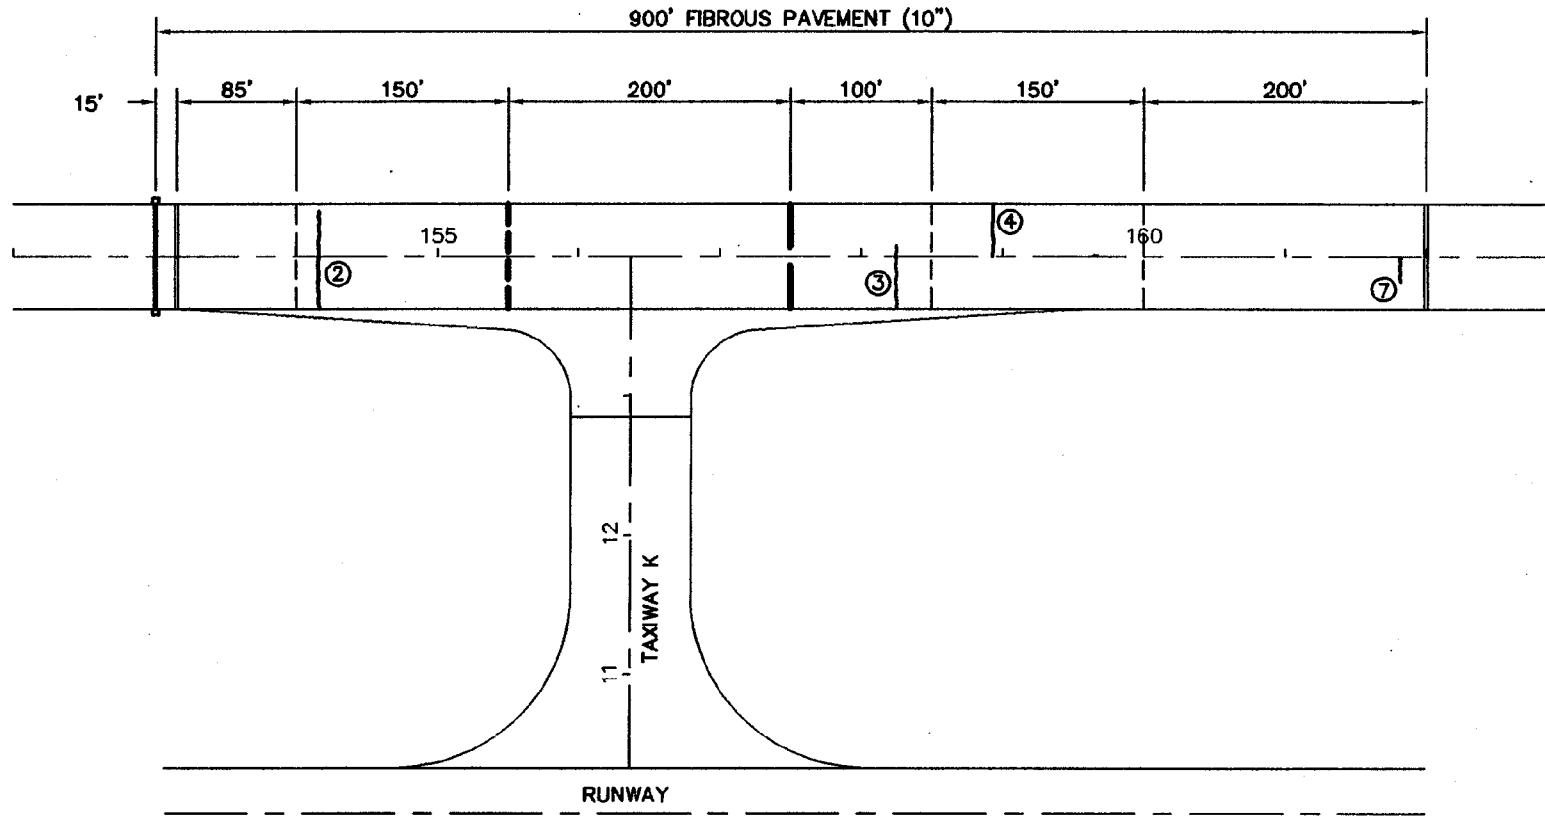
MAJOR TRANSVERSE CRACKS IN FIBROUS PCC PAVEMENT, SUMMER 1998
